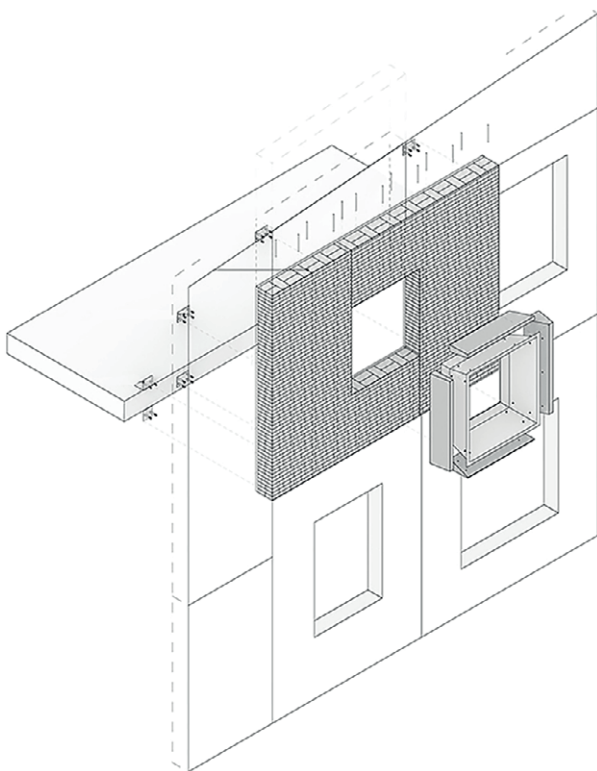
| Reuse of existing external walls ‘in parts’ to create new façades.
